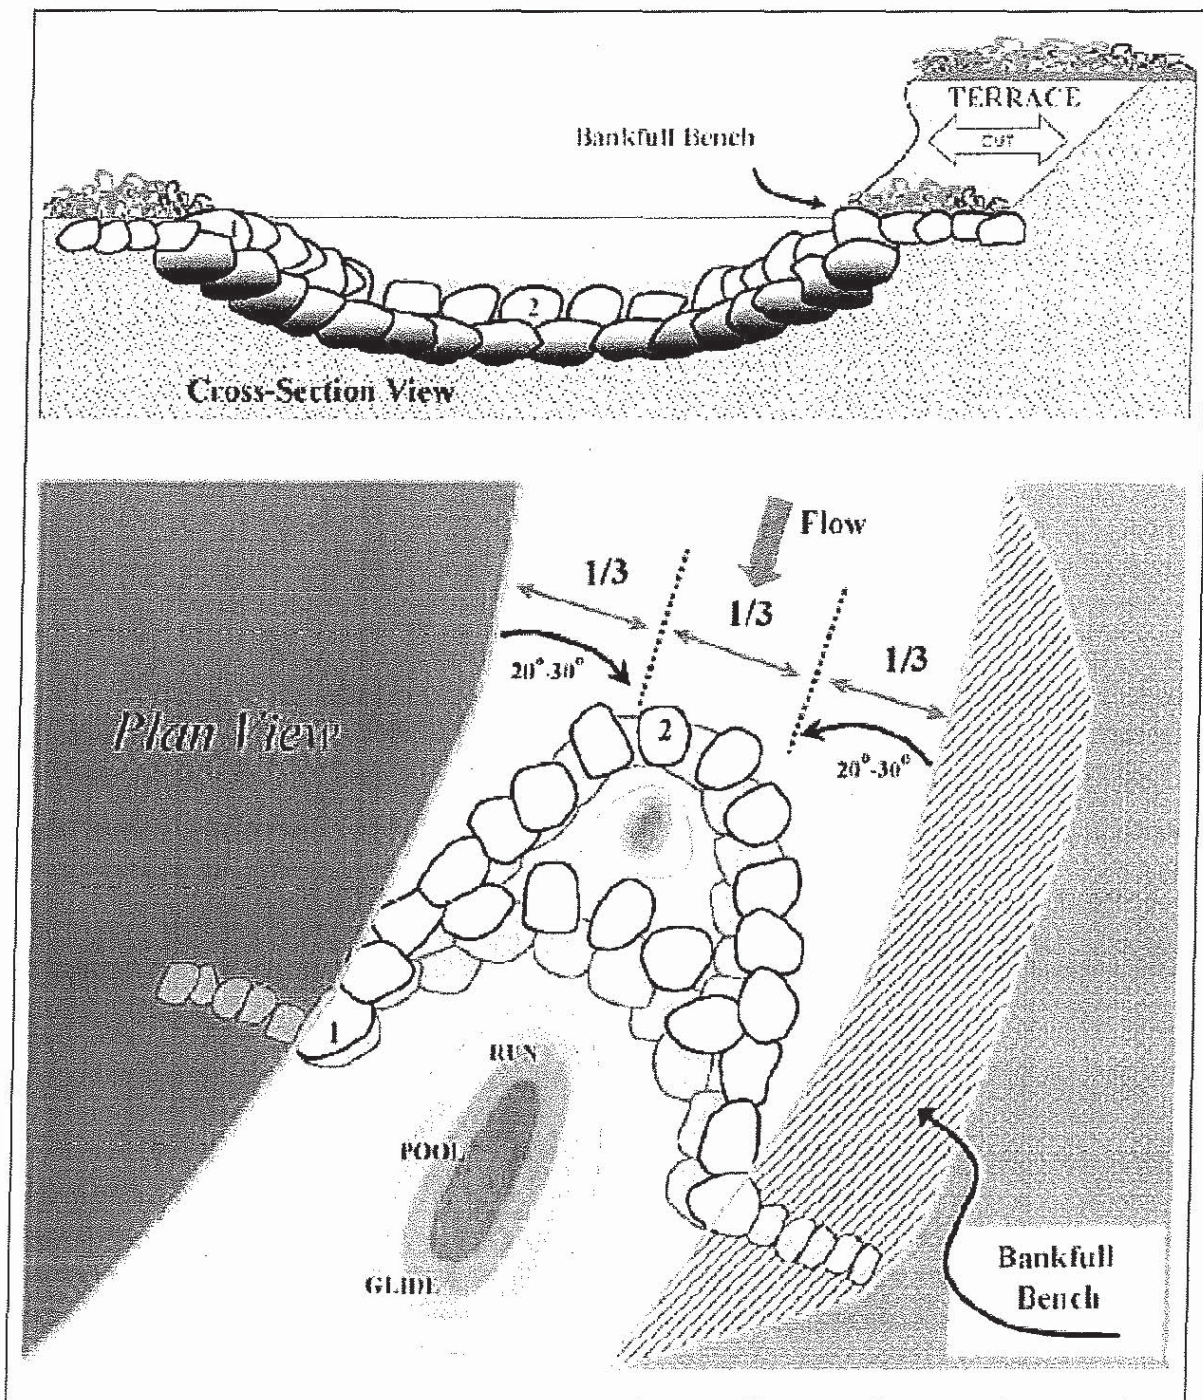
Boulder cross vane and constructed bankfull bench (NRCS, 2007).
